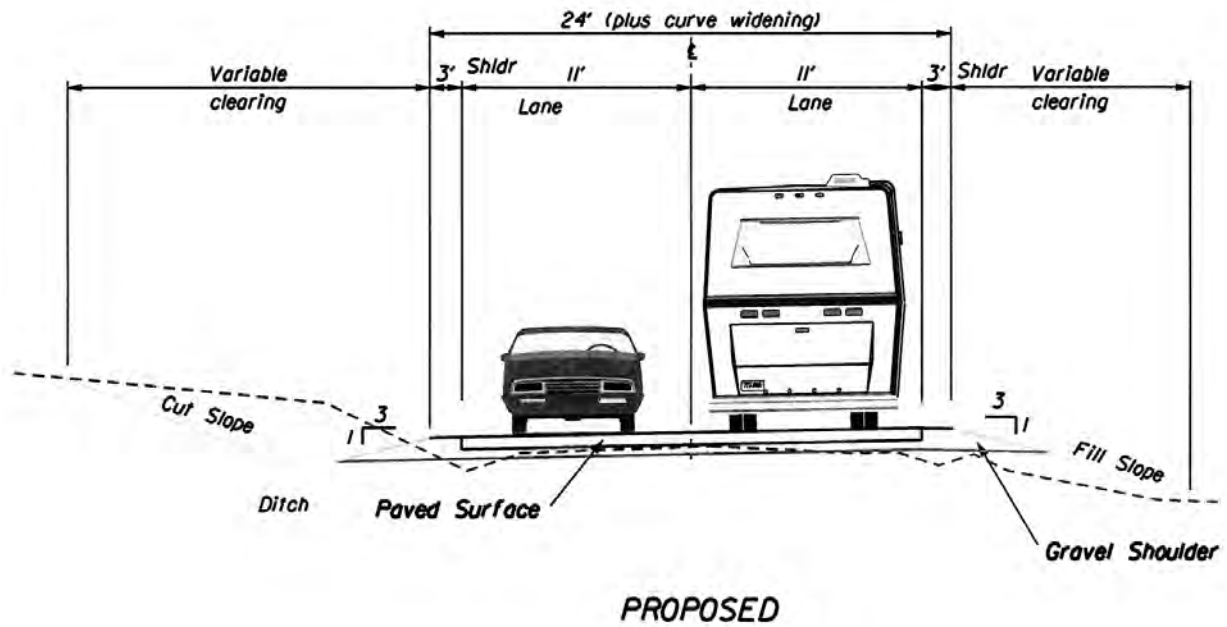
Camp Grisdale Road section for proposed conditions.
